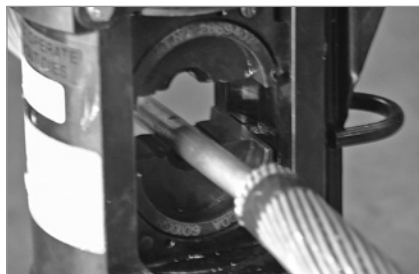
Make the initial compression on center of Steel sleeve.
